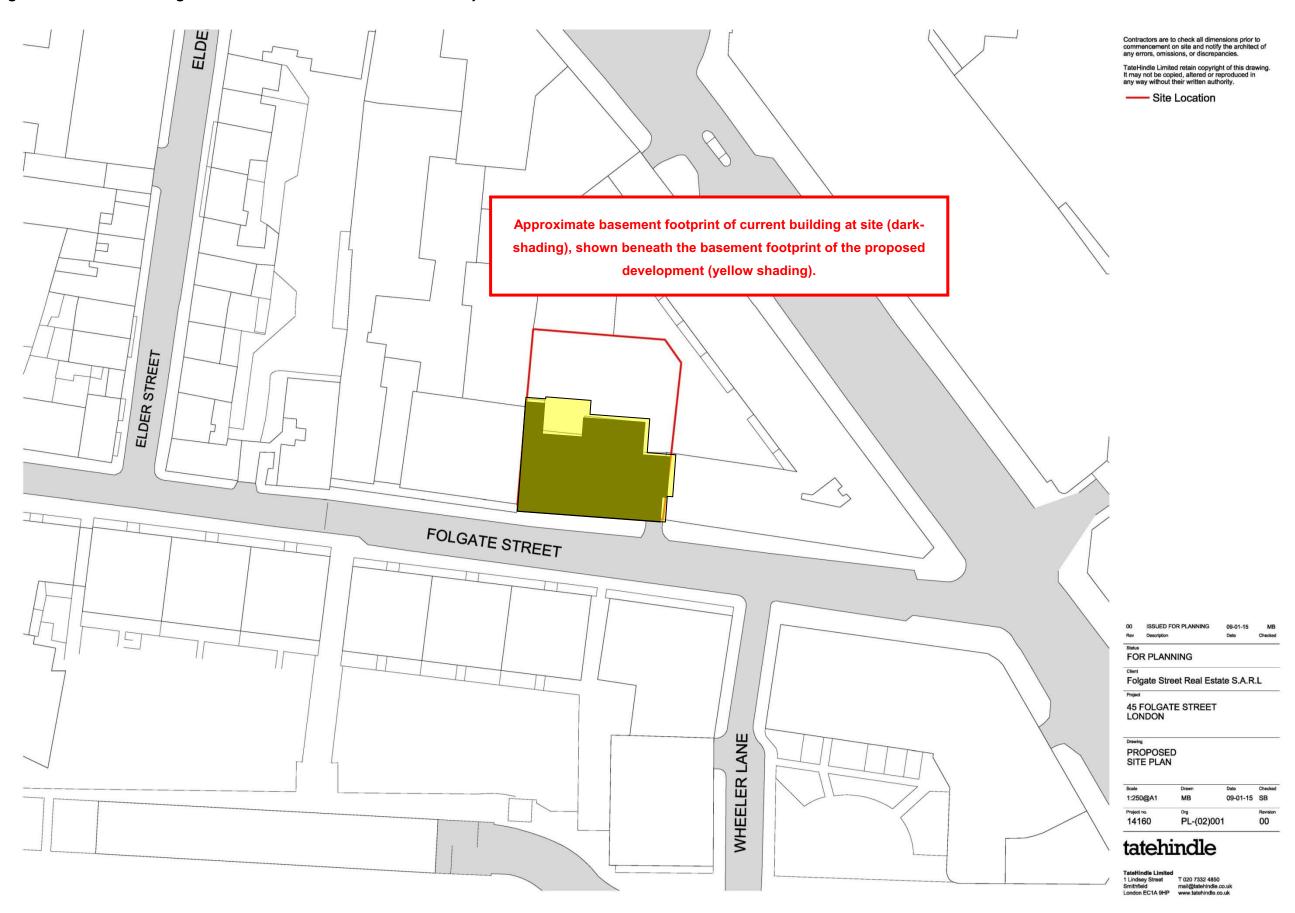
Plan of Existing Basement Site Plan overlaid with Proposed Basement Site Plan
